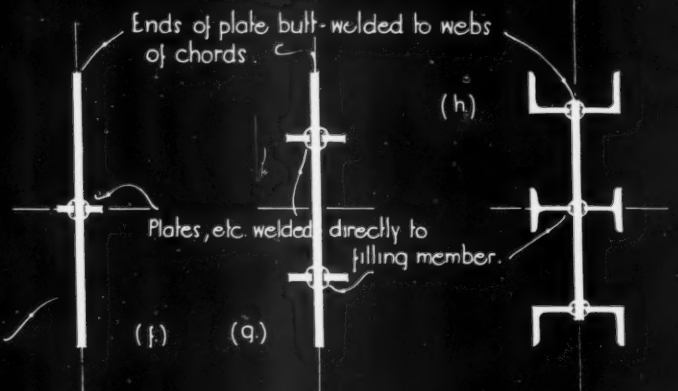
TYPICAL EXAMPLES OF SECTIONS FOR LOWER CHORDS OF TRUSSES.
